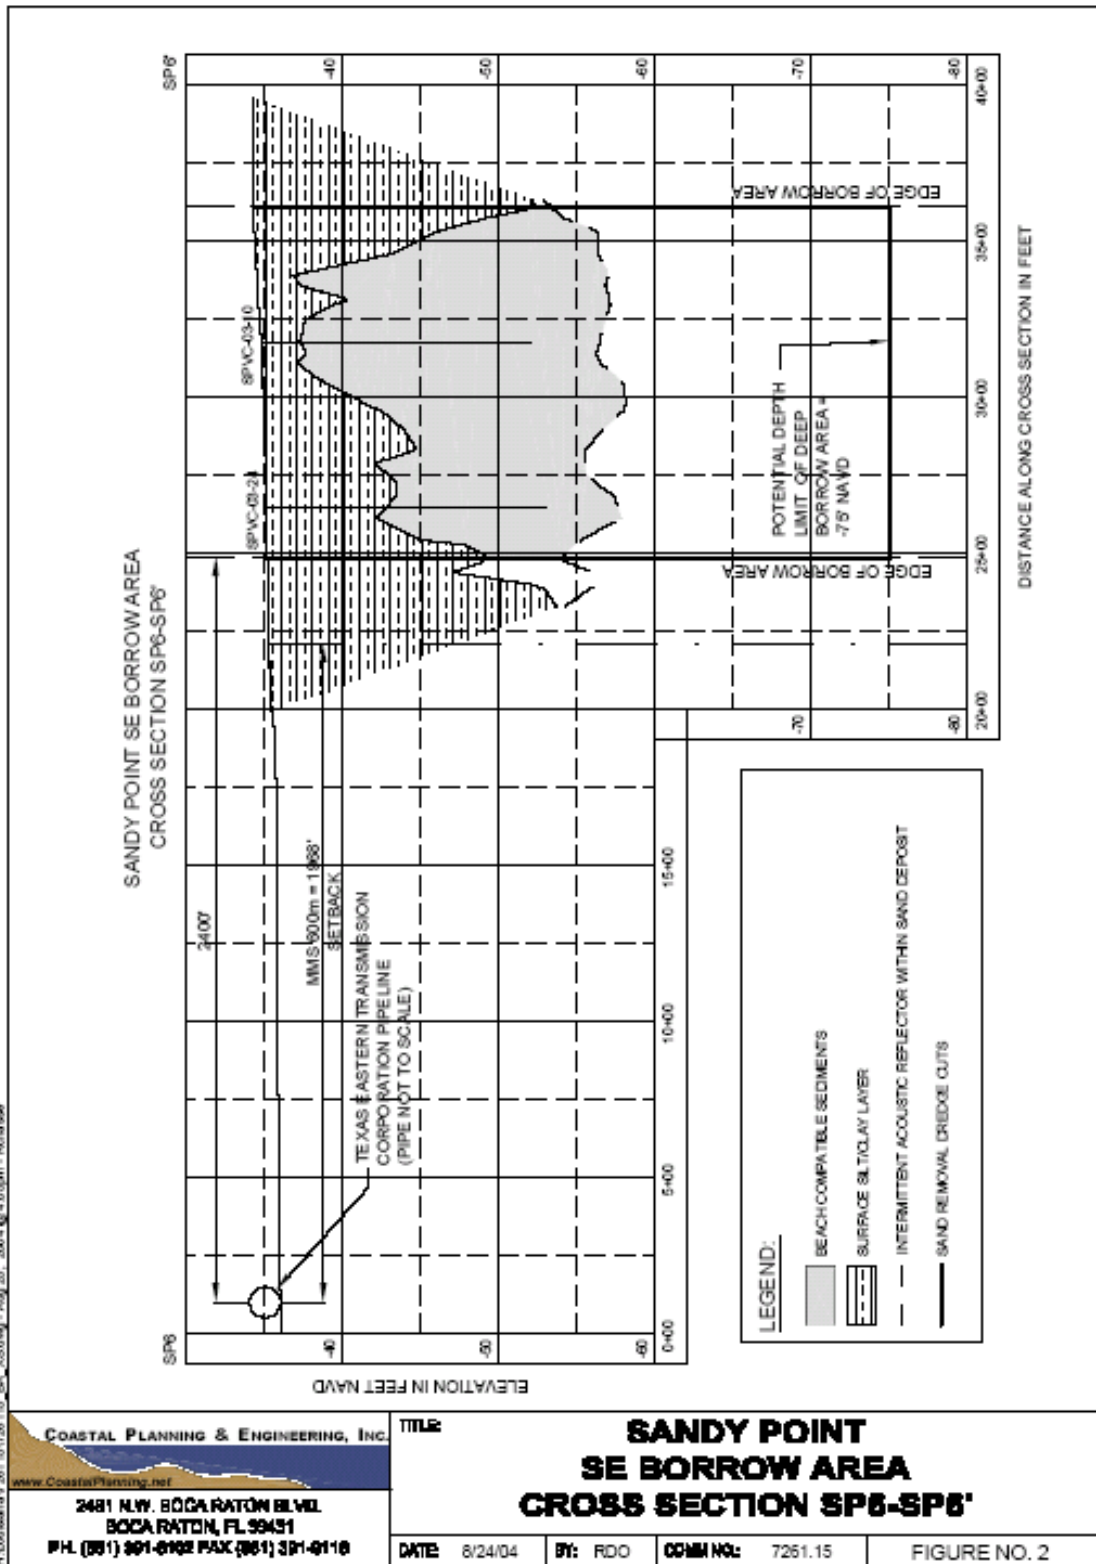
Cross-Section of the Southeast Sandy Point borrow design (from LA DNR and Coastal Planning & Engineering).
